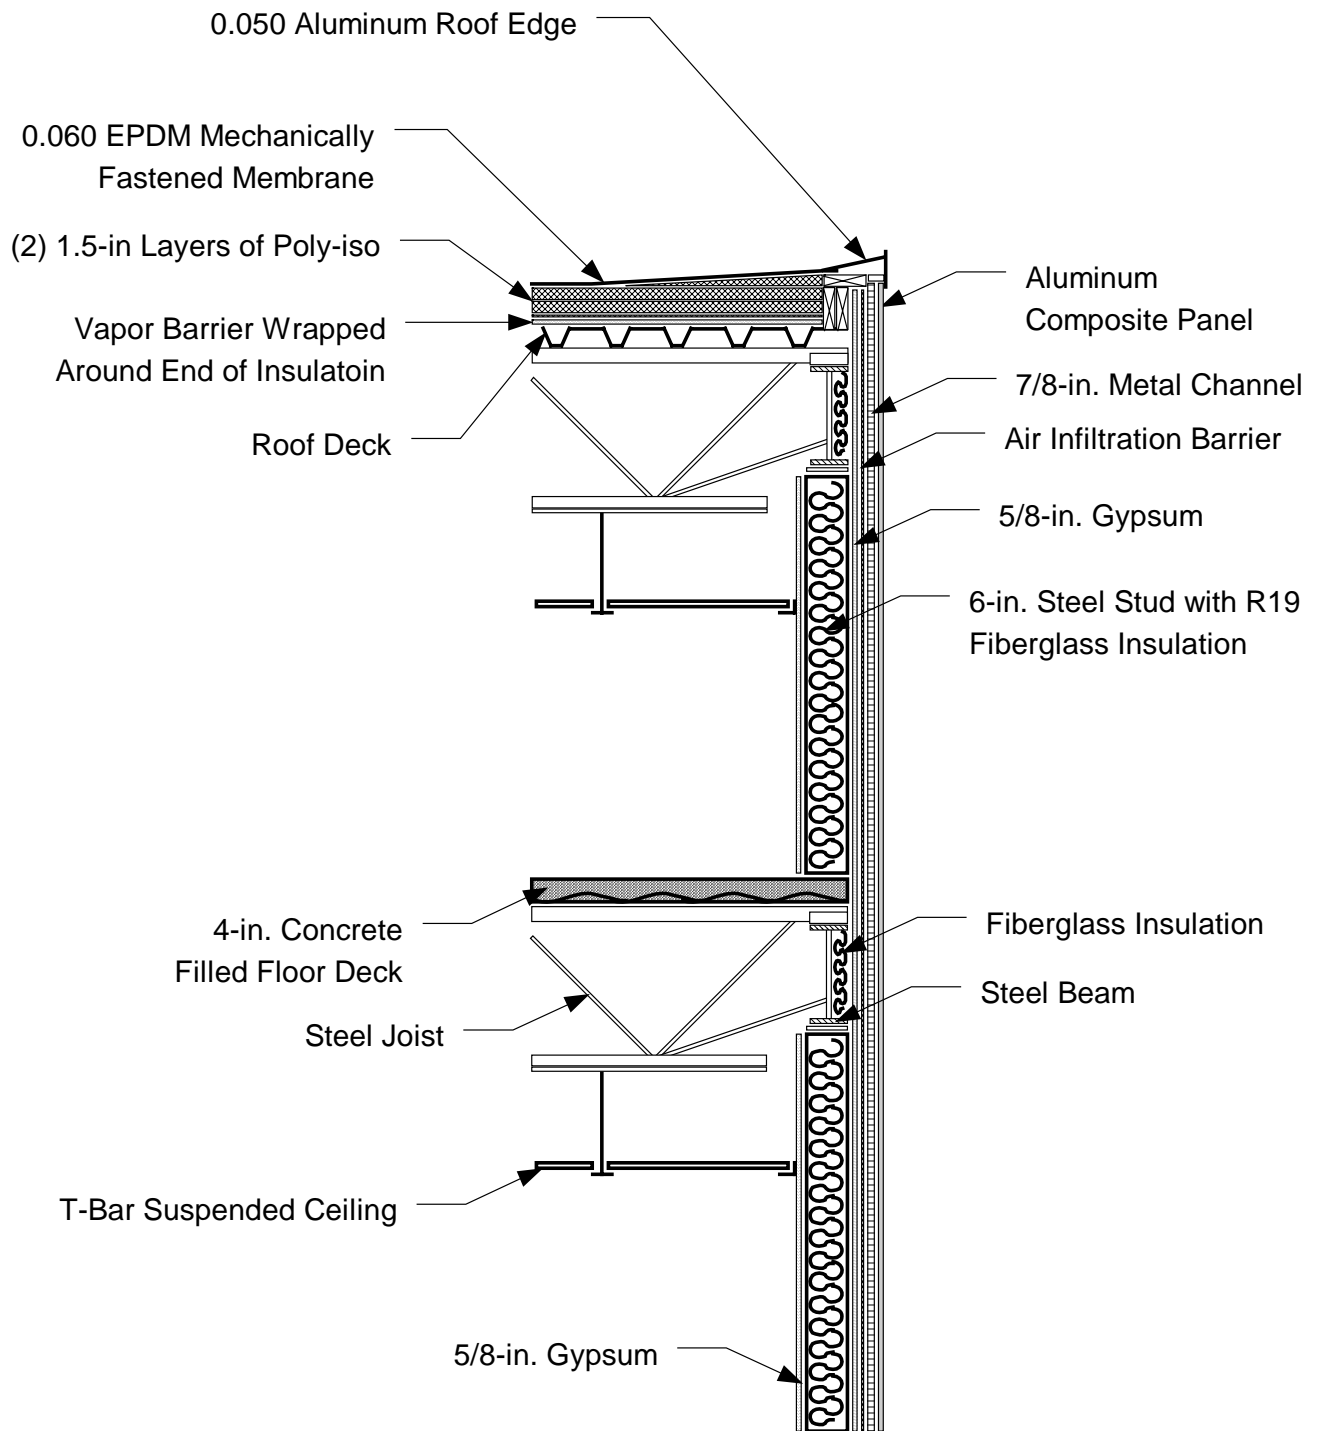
Exterior Wall and Roof Section for Two-Story Office Section
